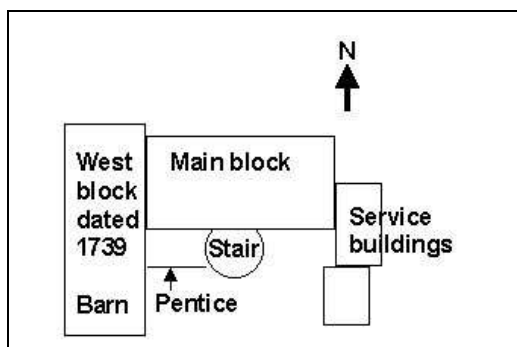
Simplified plan of Little Ash farmhouse (not to scale)
